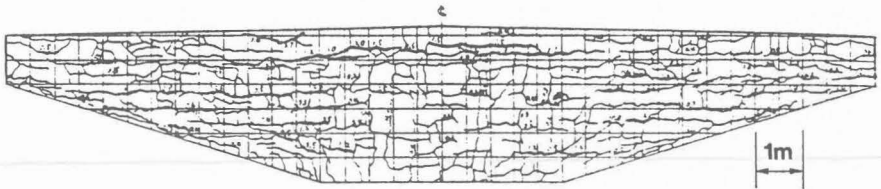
Crack pattern of pier deteriorated by ASR
